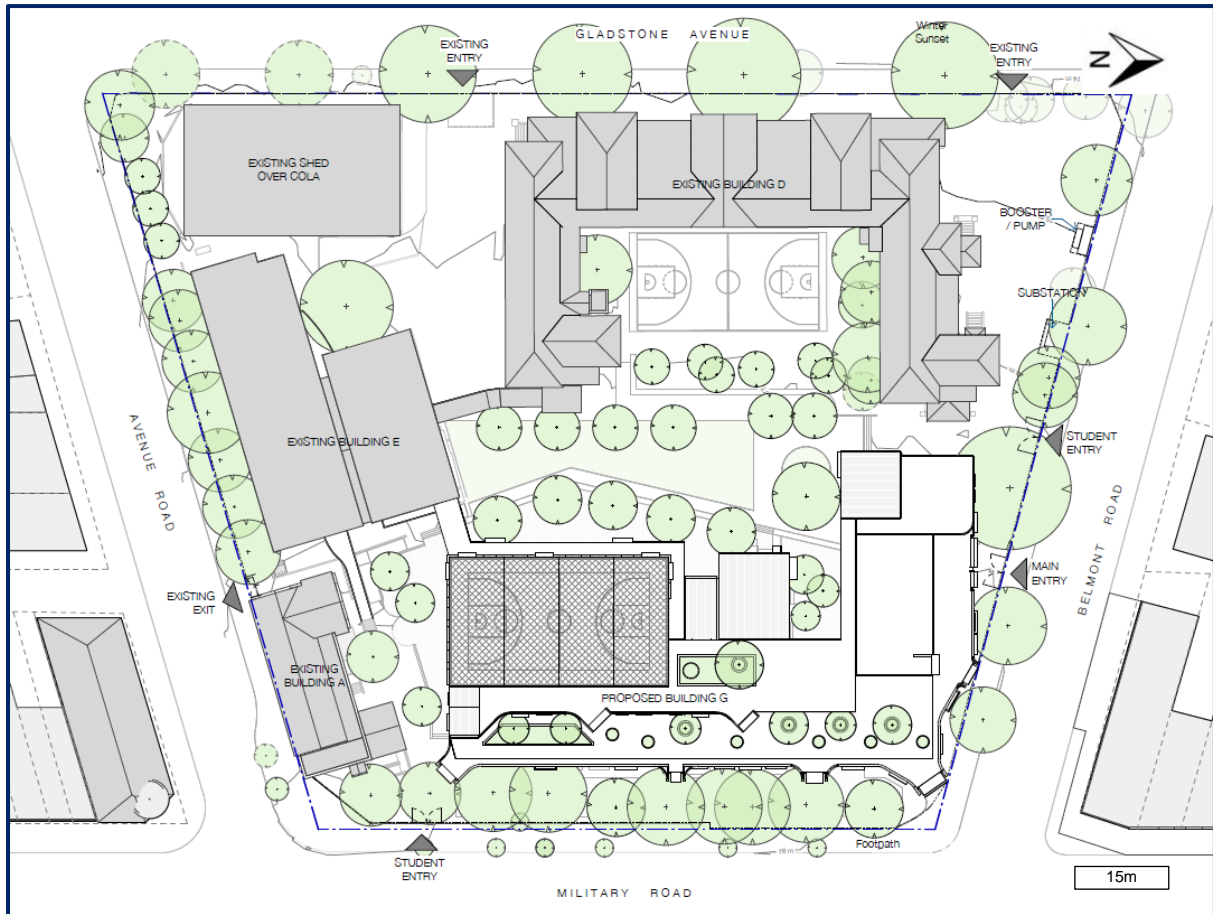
| Proposed Site Plan (Source: Applicant's EIS, 2021)
